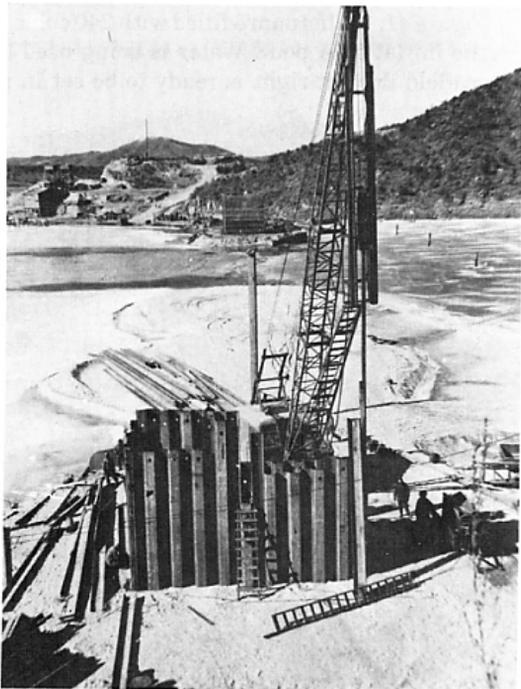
Pile driving on cofferdam 1 during February 1953. View shows curing cabin on pier 6 on far causeway and the concrete batch plant on the far shore.
